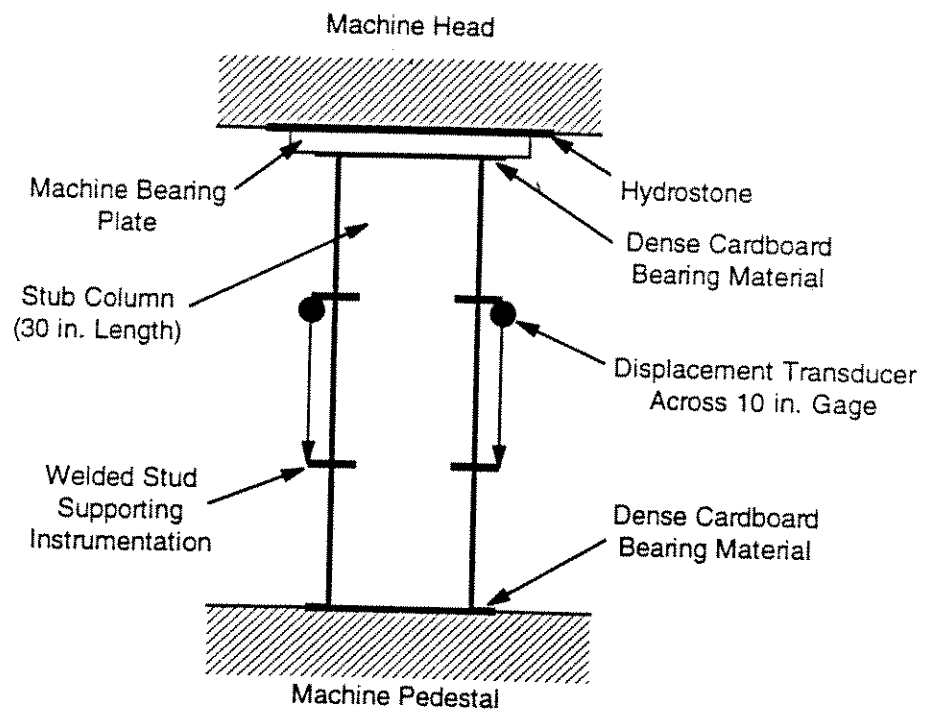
General Stub Column Test Set-up and Instrumentation ( $D/t = 34.5$ )
